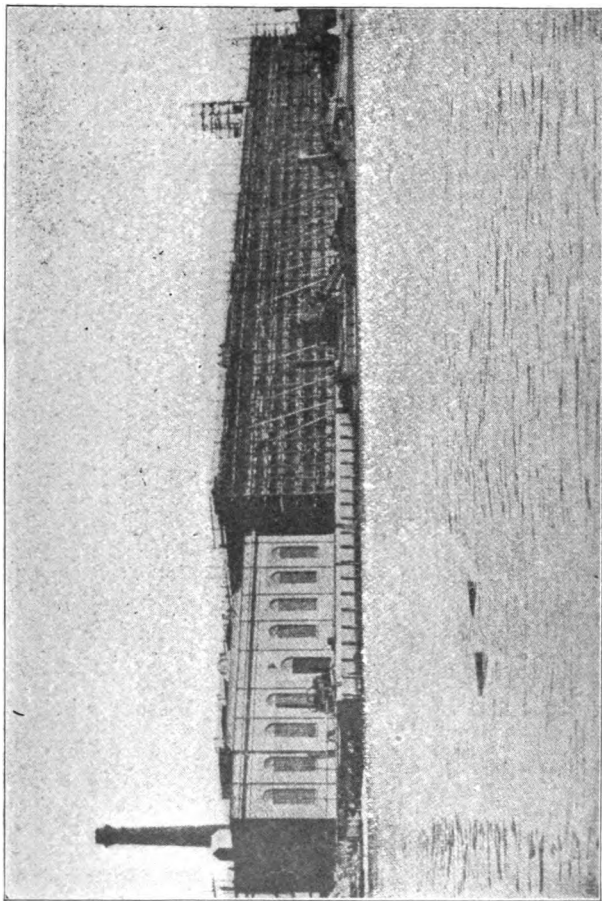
Cold storage warehouse and power house, Southampton, England. Built entirely of armored concrete. Size 400x120 ft. Roof of power house has a span of 50 feet and with the parapet wall forms a tank.
